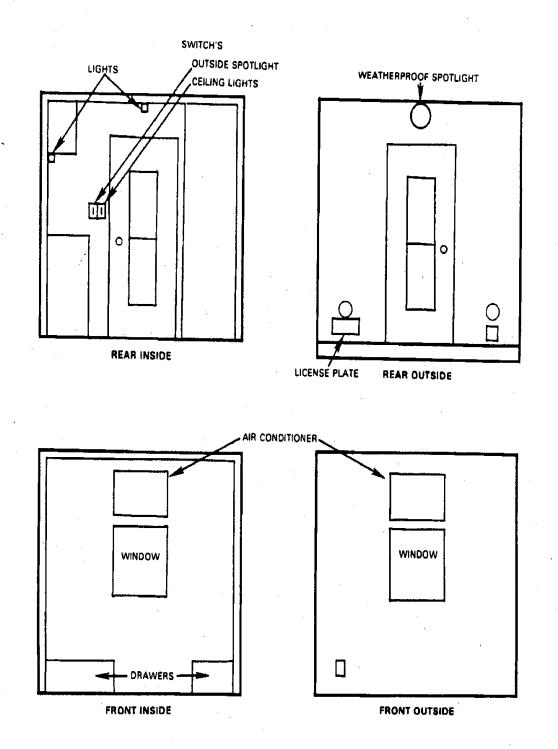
Mobile bioassay laboratory, tandem-axle trailer, external and internal end views.
